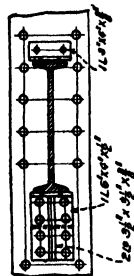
Standard connections beams to columns for 21-in. and 18-in. I-beams with reactions not more than 42,500 lb.
